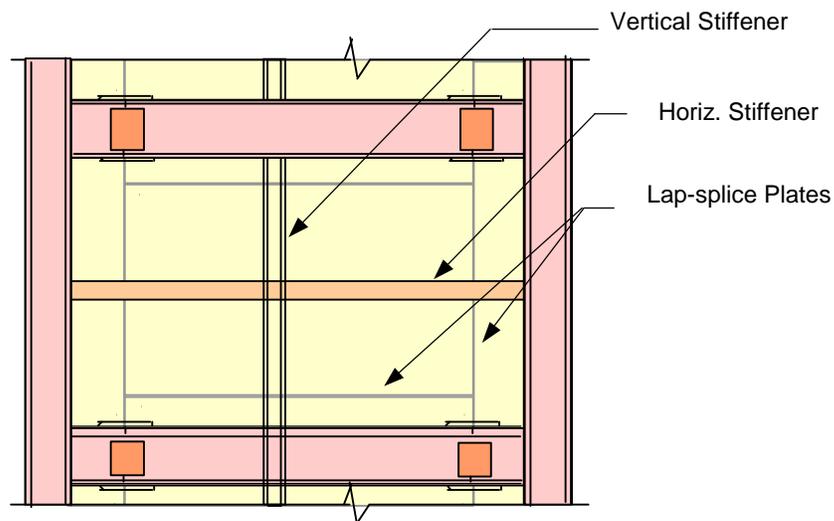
Details of steel shear walls used in Nippon Steel Building
